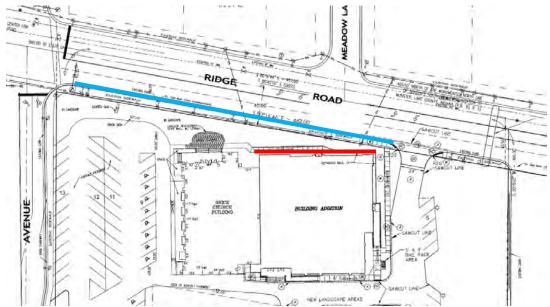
Building facade position shown in red; Ridge Road Frontage line shown in blue
